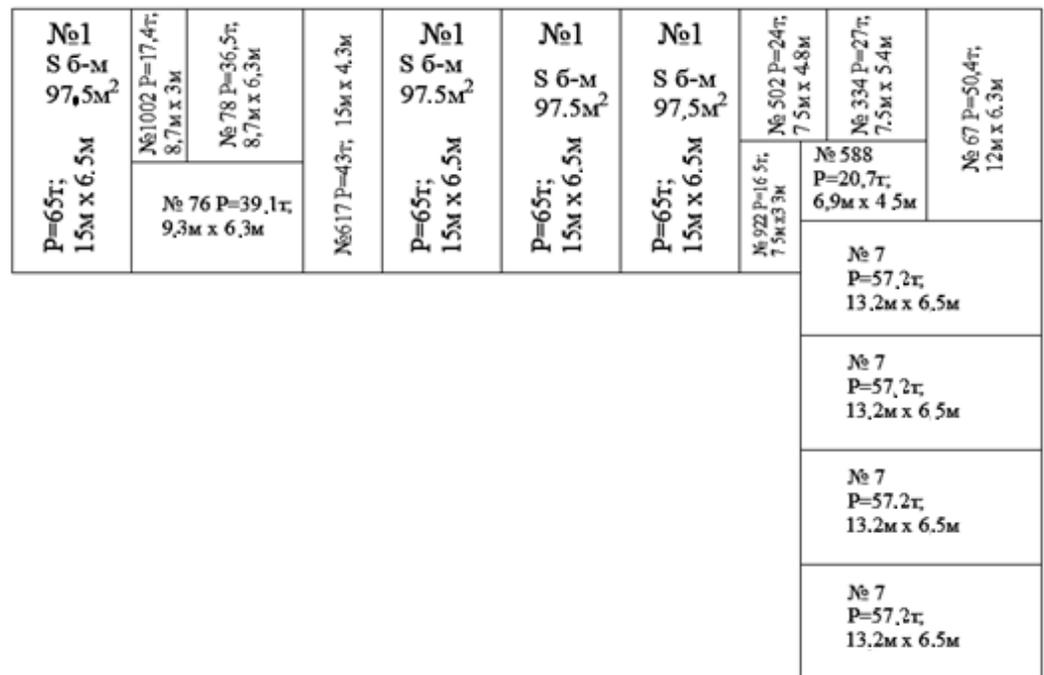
Floor layout of volumetric blocks for L-shaped buildings.
